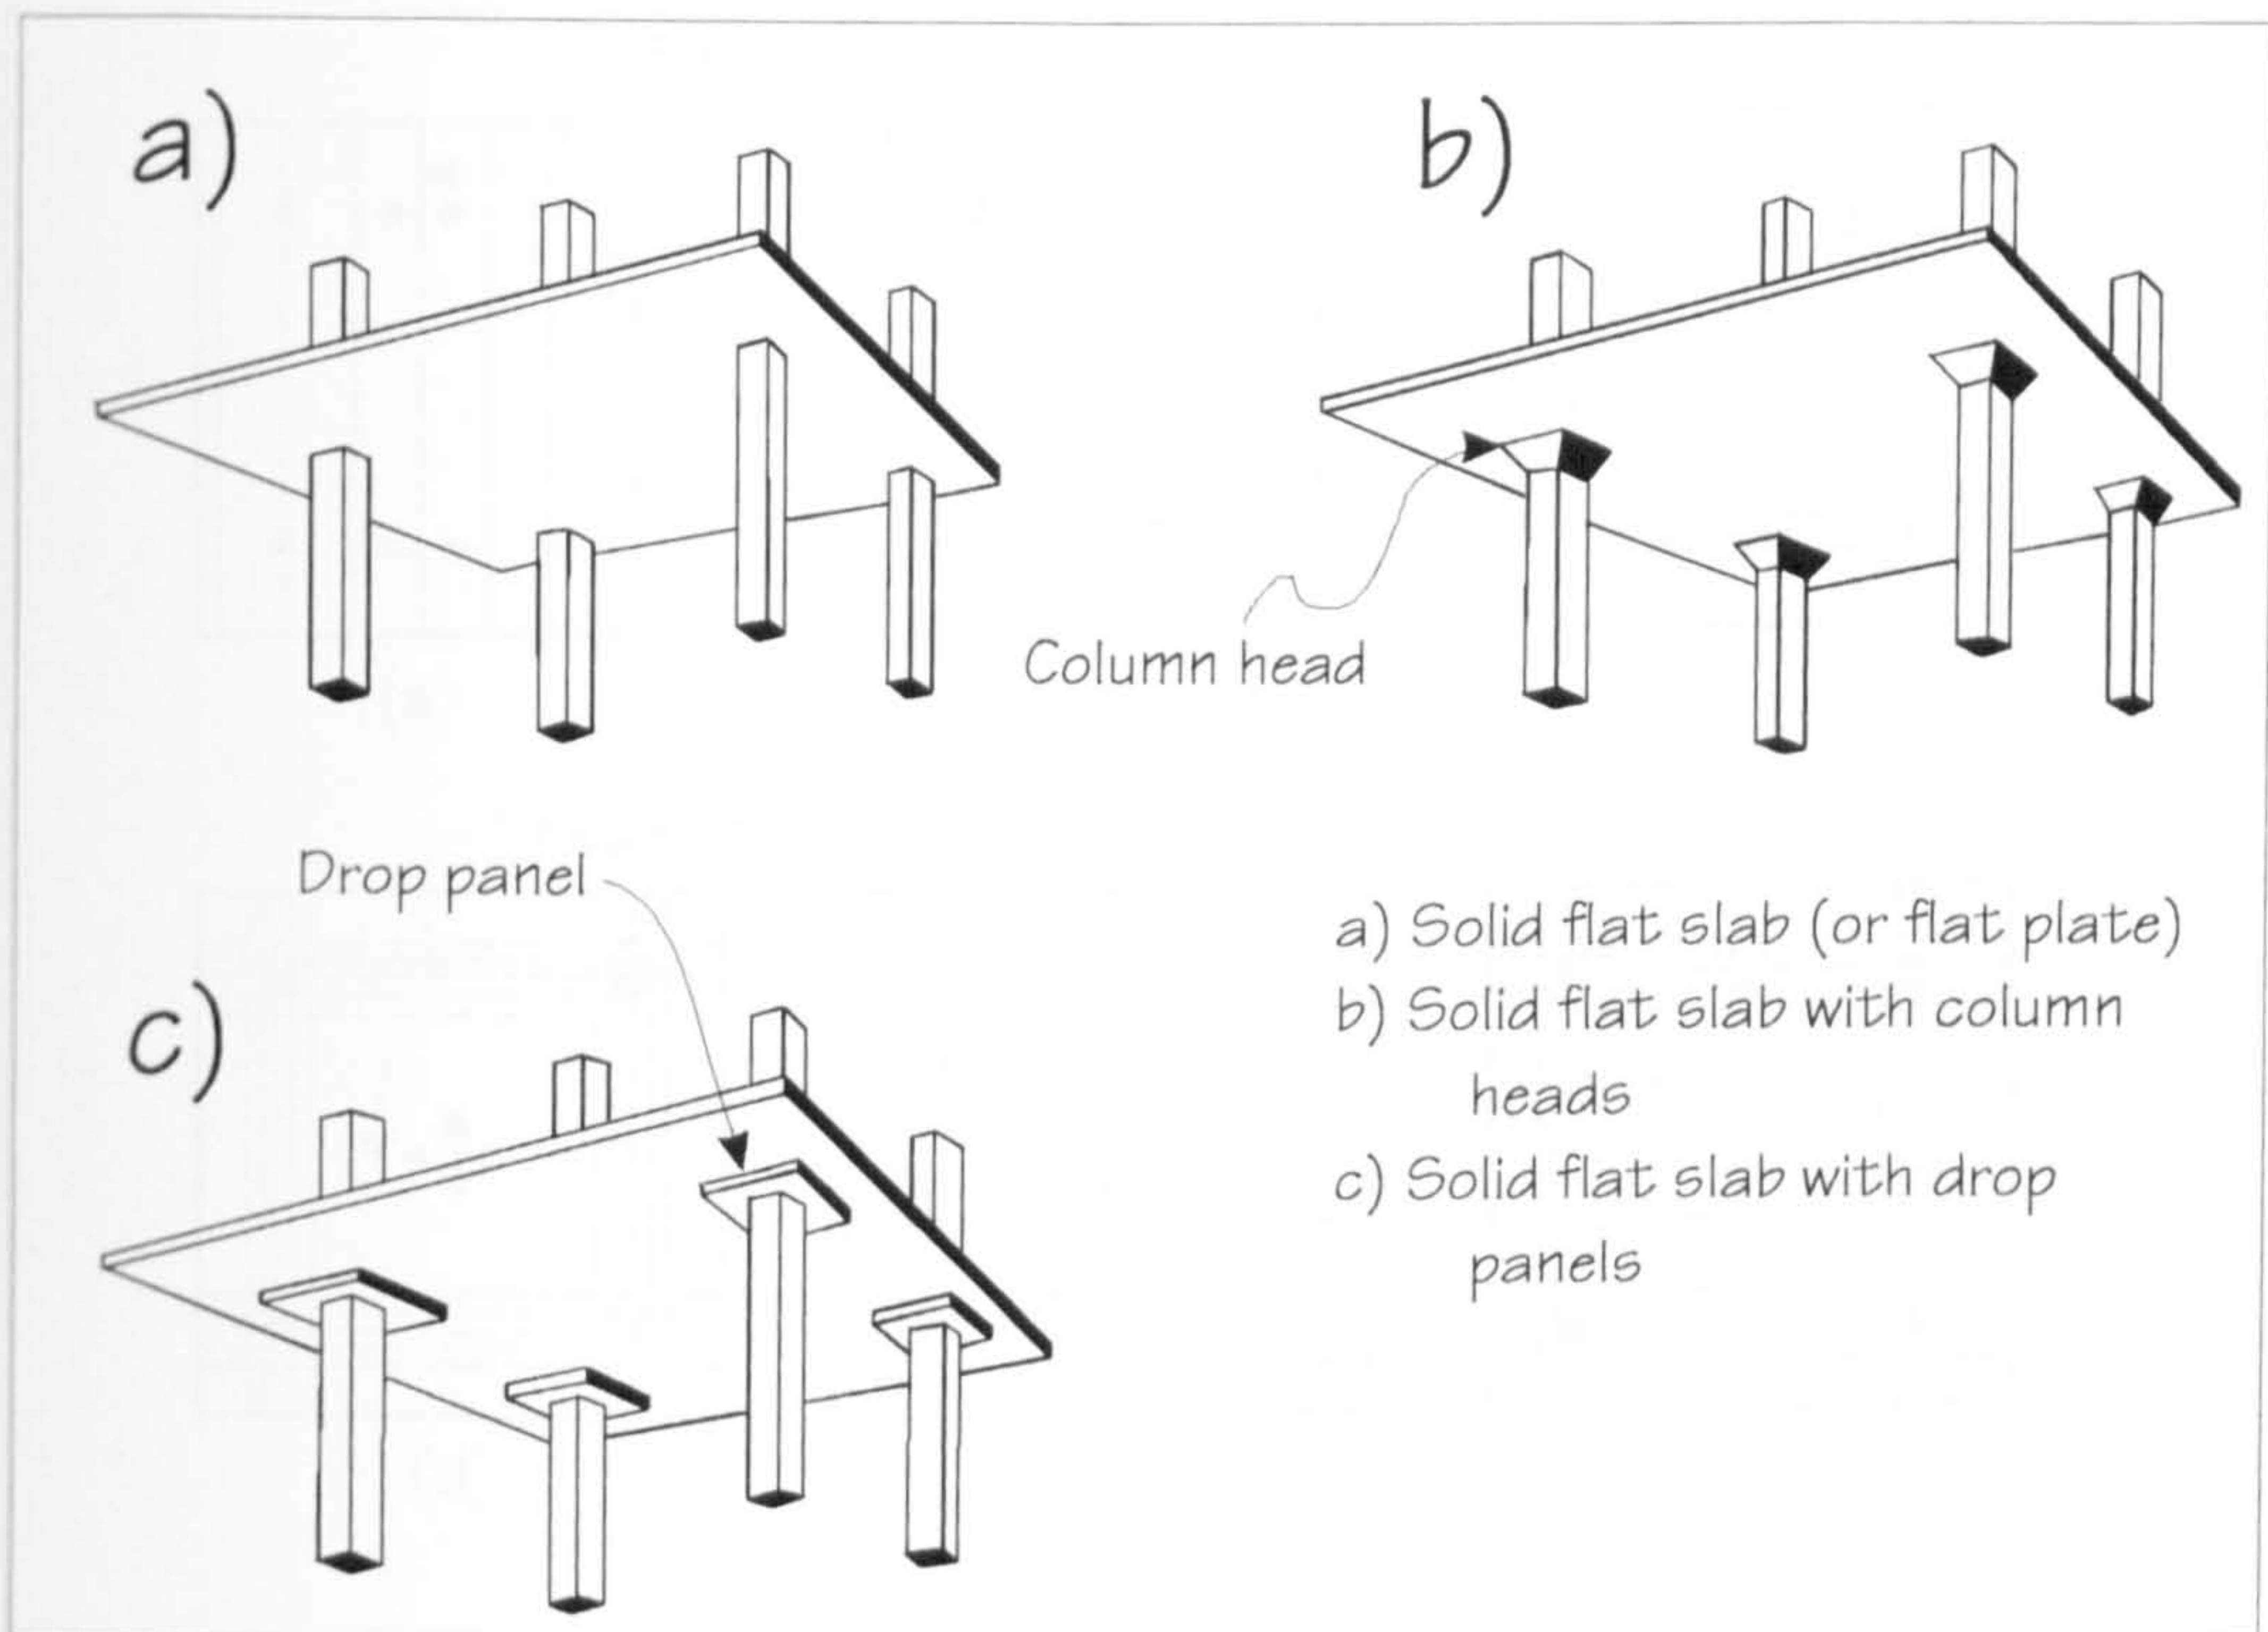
Solid flat slab construction (after Stevenson, 1994).
